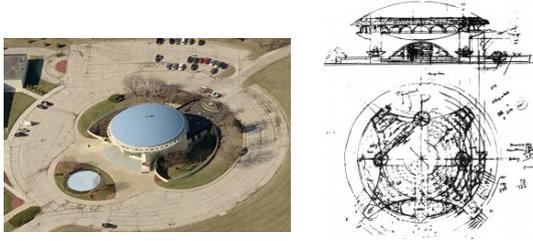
Greek Orthodox Church. Elevation & floor plan concept
